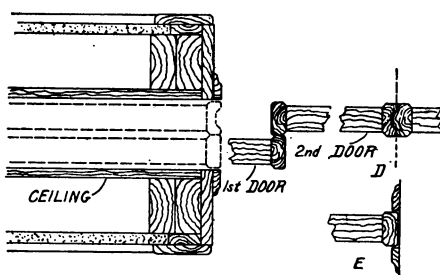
HORIZONTAL CROSS-SECTION OF POCKET
